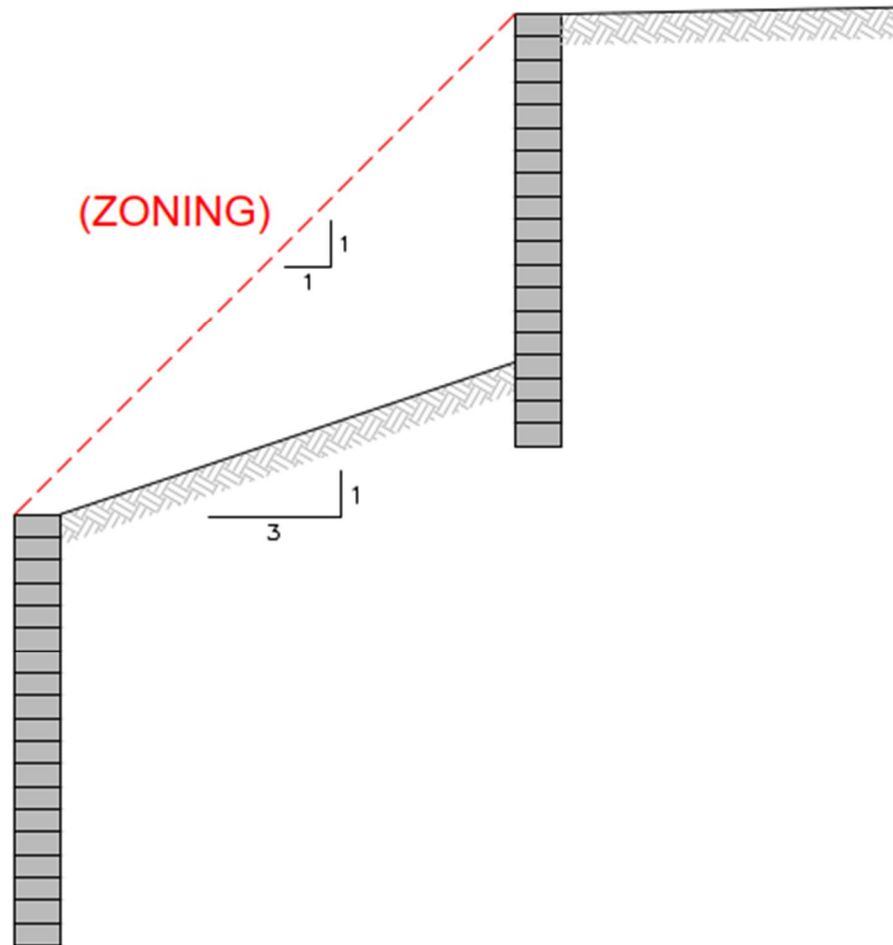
Retaining Wall Average Slope - Alternate 2 Tier Design
